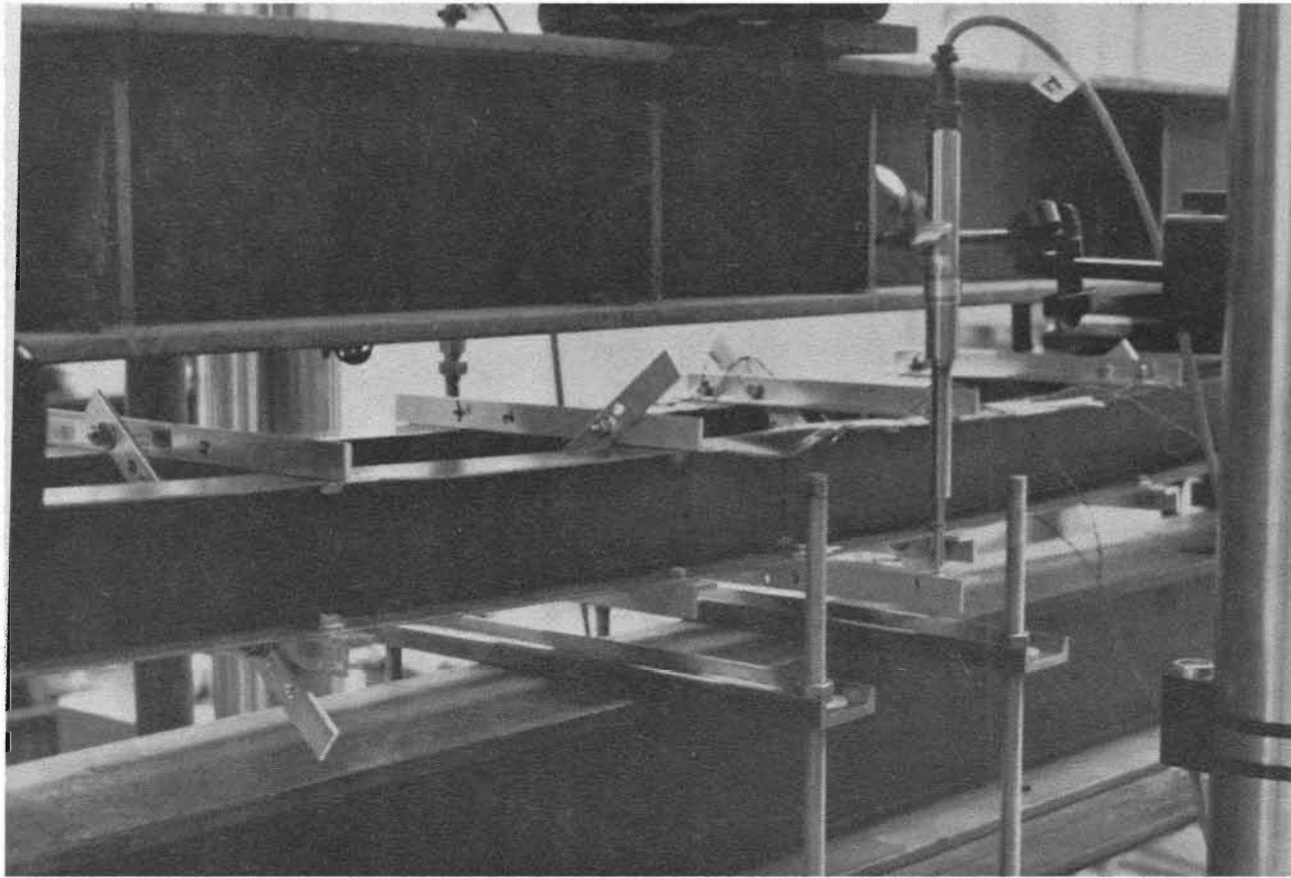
Typical Failure of Channel Beams with Unstiffened Flanges
